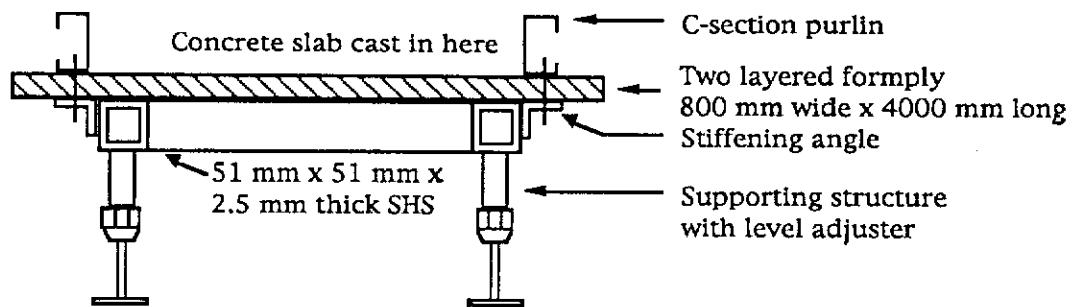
Existing Formwork Cross-section from Bailey (1989)
